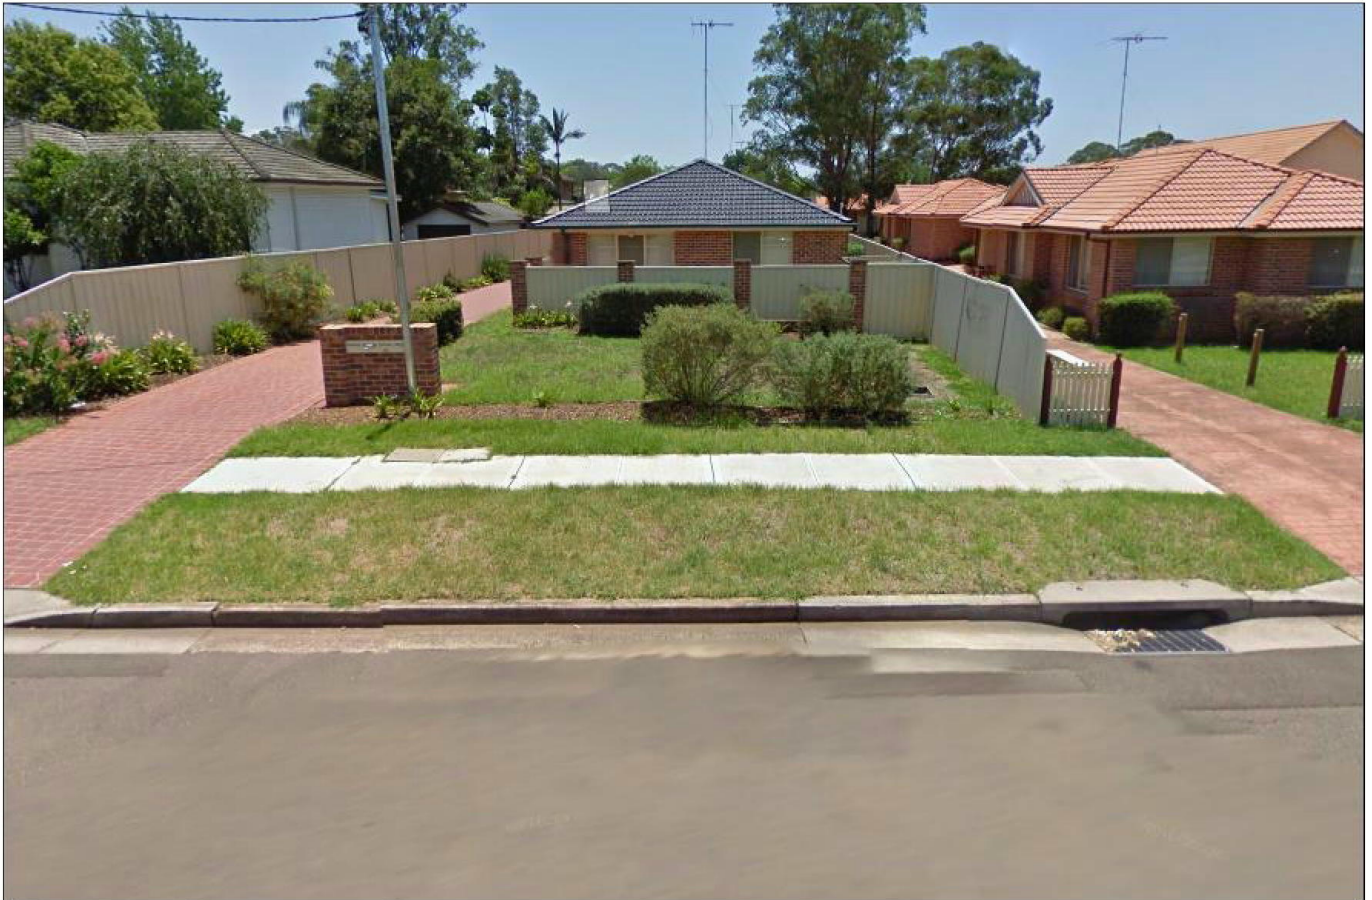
Existing kerb inlet pit at 47 Jamison Road, Kingswood (Downstream)
